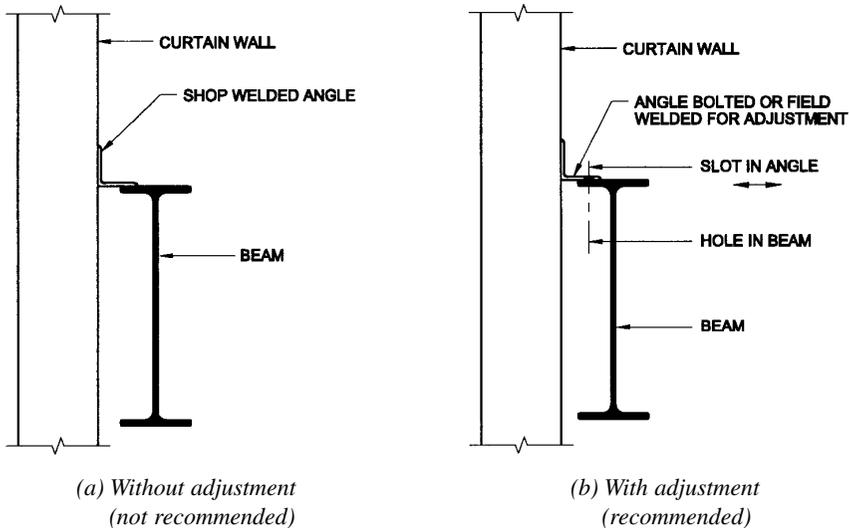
Attaching curtain wall façade systems to structural steel framing.
